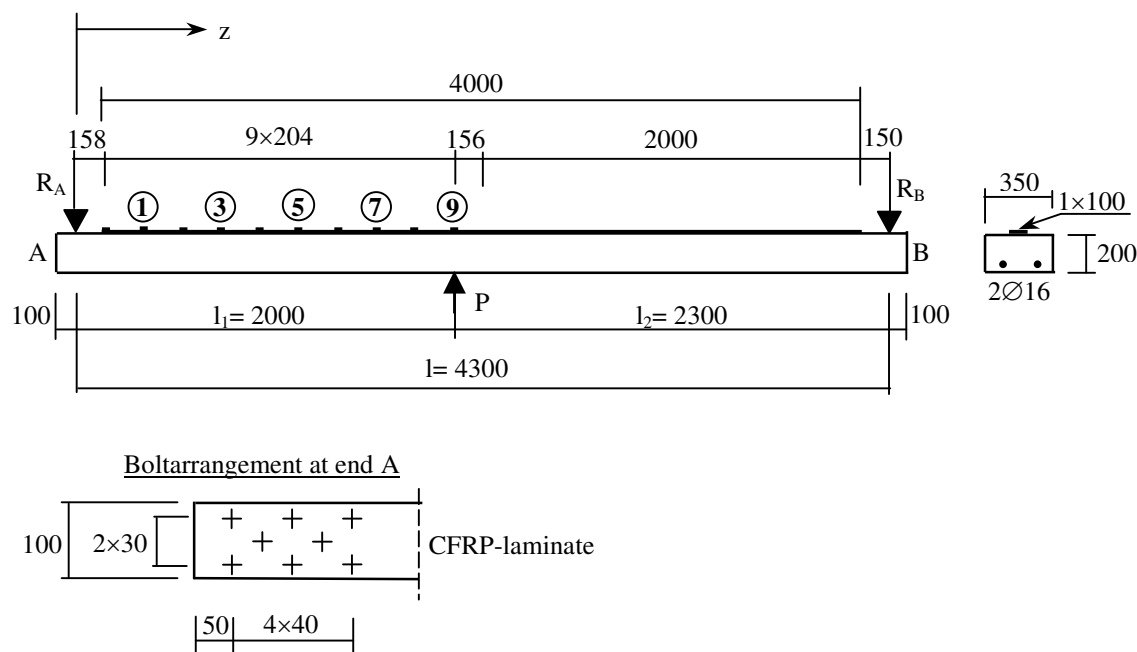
Test specimen with placement of load P , CFRP-laminate and strain gauges shown. Bolts at end B(right end) are not shown.
